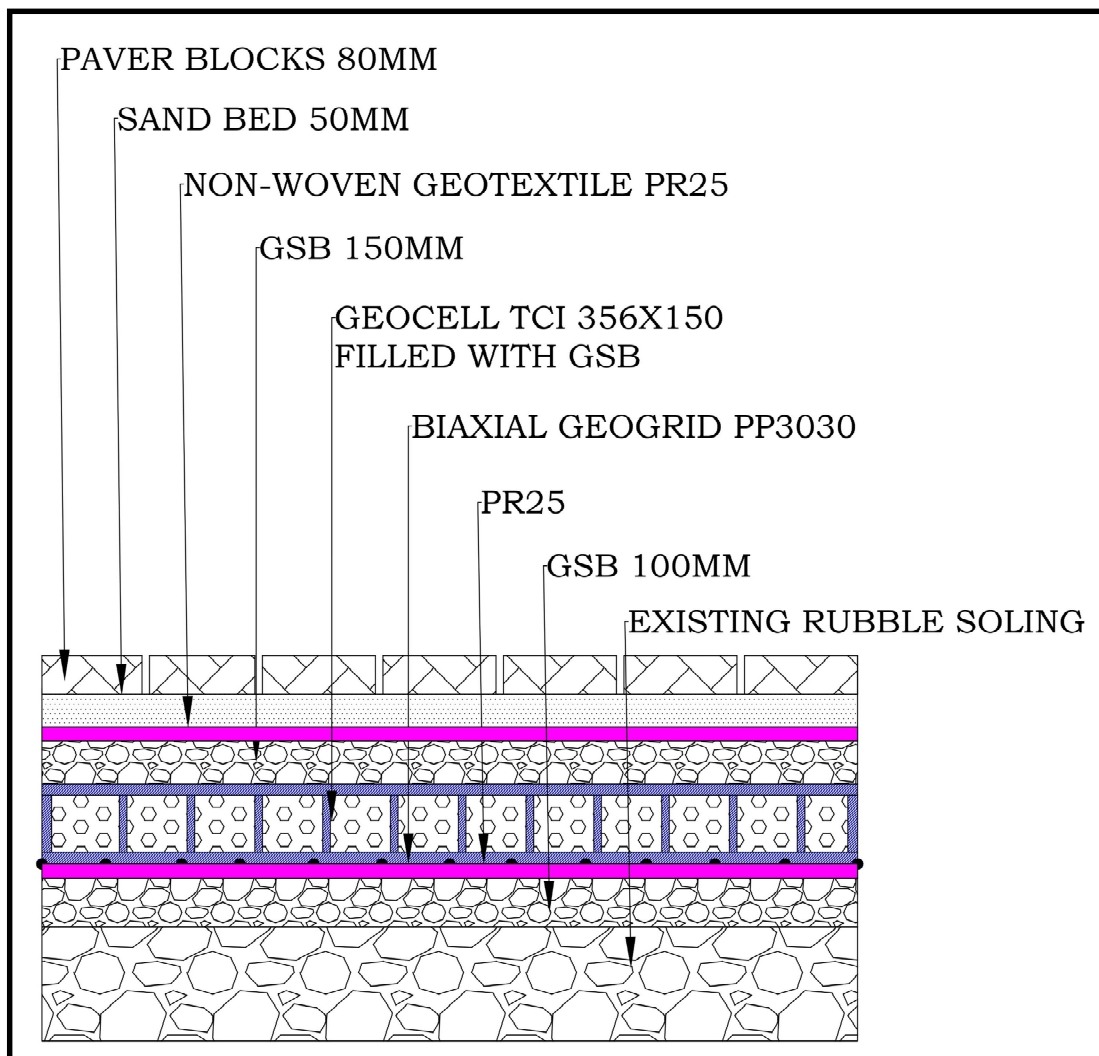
Proposed Section with TechCell Geocell, TechGrid Biaxial Geogrid and TechGeo NW Geotextile for Ground Improvement
